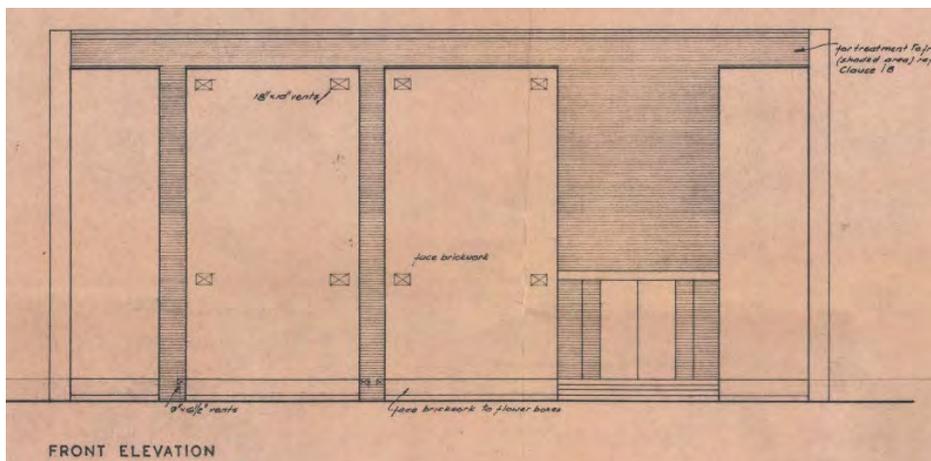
Drawing related to building permit 4609. Proposed front elevation (K Popper, Nov. 1972) (Source: Council Building File)
